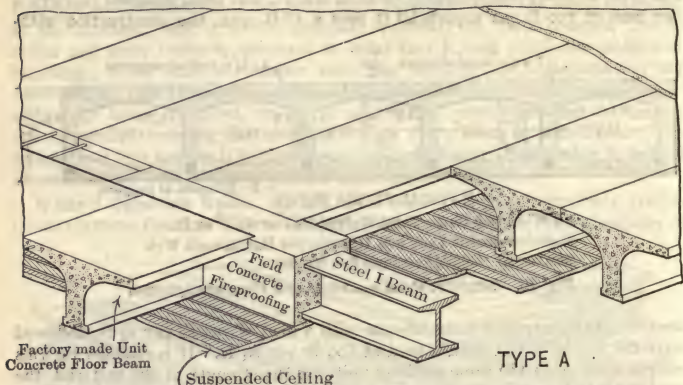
Watson Reinforced-concrete Floor-construction. Without Slabs
